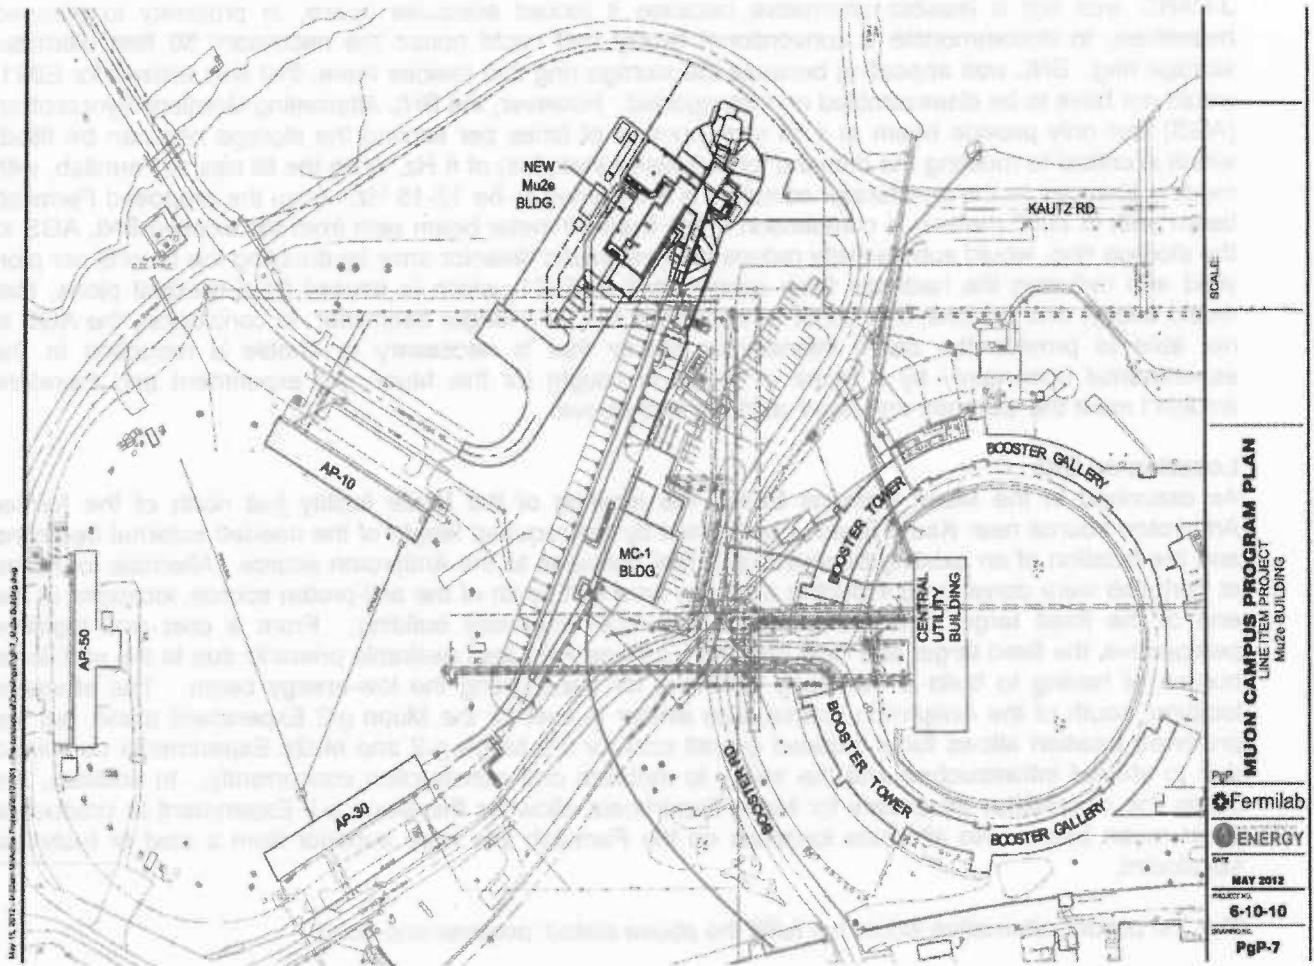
Layout of the Muon Campus showing the MC-1 Building, which would house the g-2 Detector and superconducting coils.
